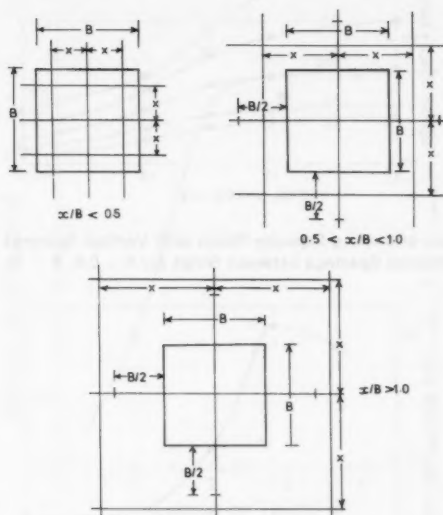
Reinforcement Arrangements for Three Stages of Footing Failure at any Spacing between Layers
